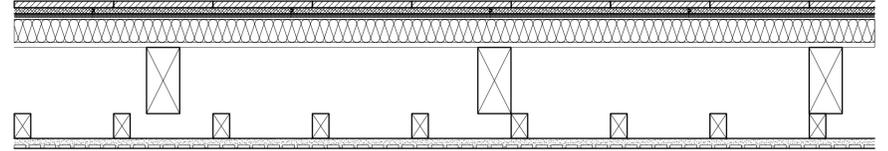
DETAIL A - ROOF VOID TO BEDROOM 5 (BATHROOM 5) - as existing.
